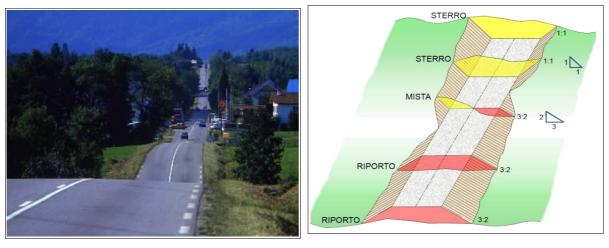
Spacial alignment of the road (source: Figure 56. Excavations and reports for building the road http://www.sapere.it/enciclopedia/strada.html) body
